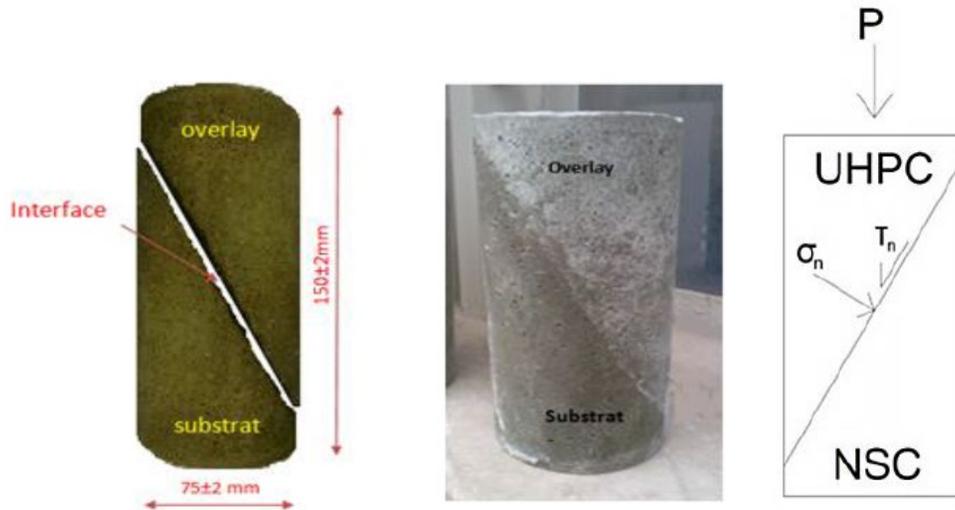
Slant shear bond test specimen (Dawood et al., 2017).
